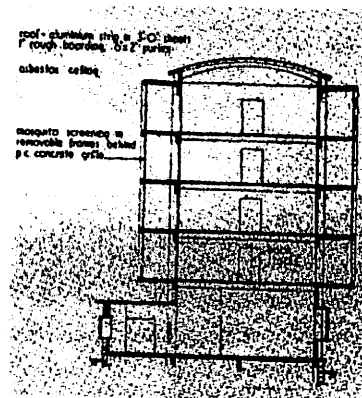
Section of Univ. College Library (Source: Tropical Arch. by M. Fry & J. Drew)
